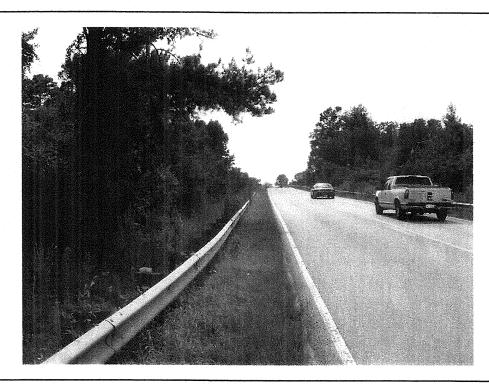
This photograph was taken from the existing bridge, left of the -L- alignment, looking south, across proposed Interior Bent No. 8.
